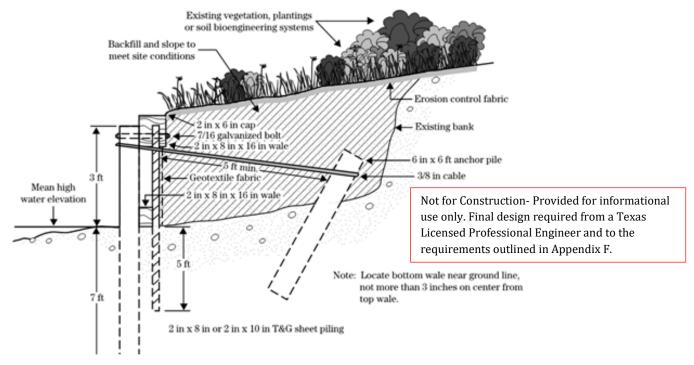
Bulkhead Example, Sheet Piling Cross Section (USDA 1996)
